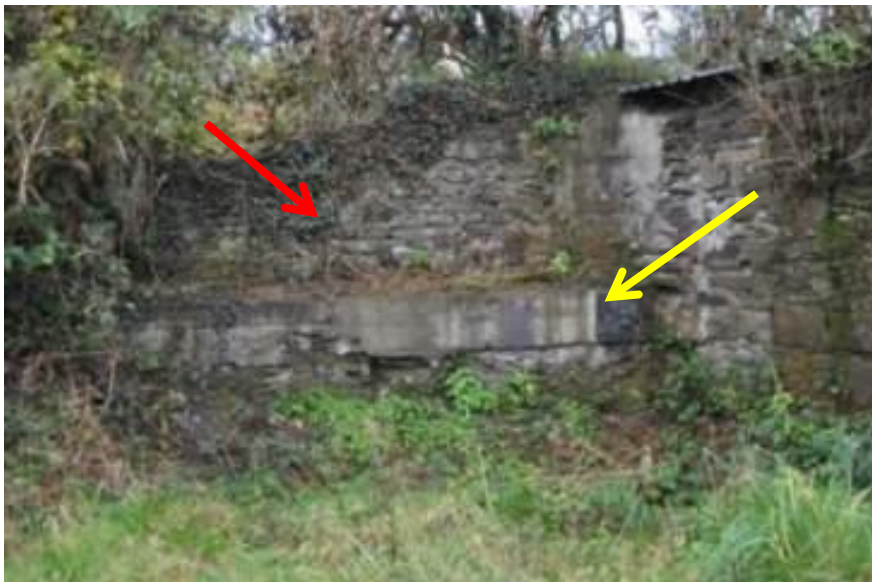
Original wall visible at base with concrete render to south elevation (yellow arrow). Later wall built on north edge (red arrow).
